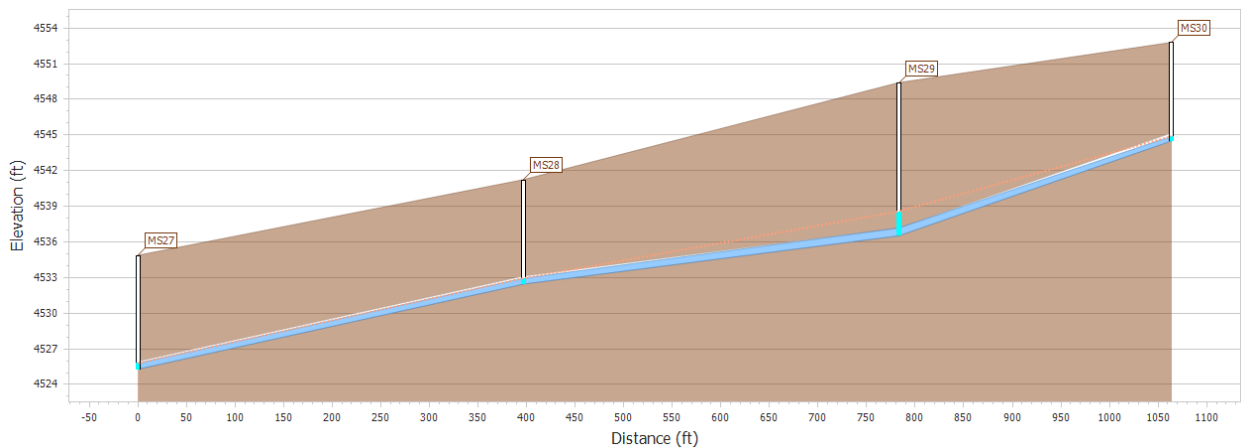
W 200 S Trunk – Master Plan HGL
